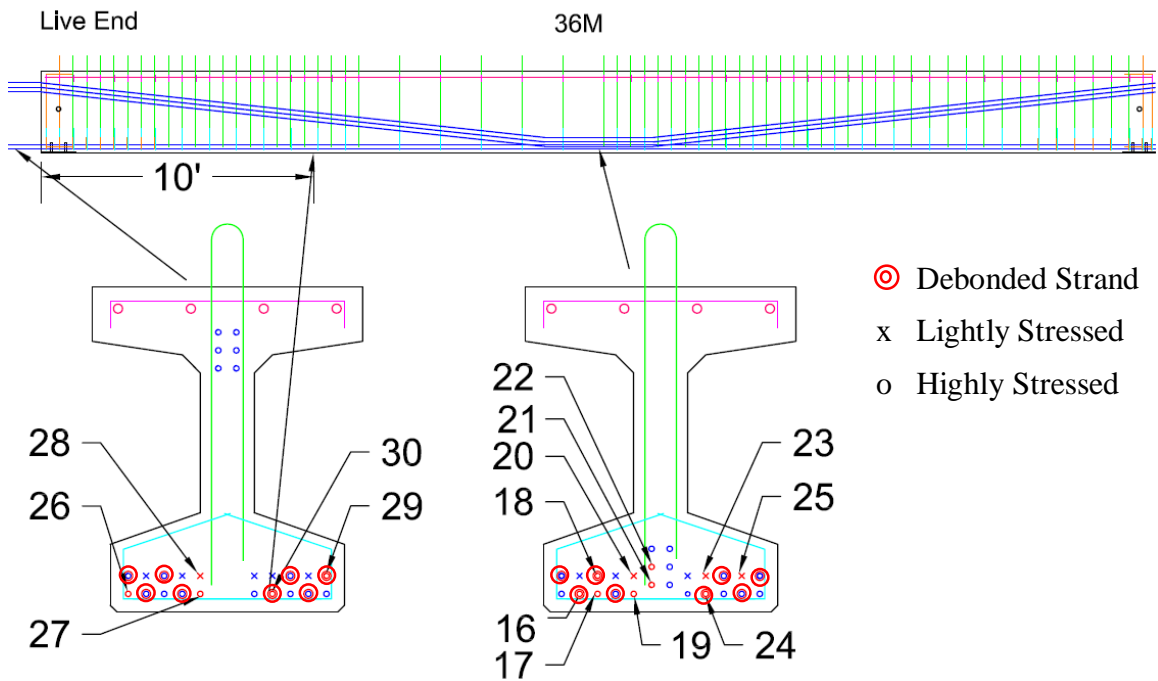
Prestressing strand strain gage locations and naming conventions for the 36M girder. The cross-sectional view is looking down the girder towards the live end.
